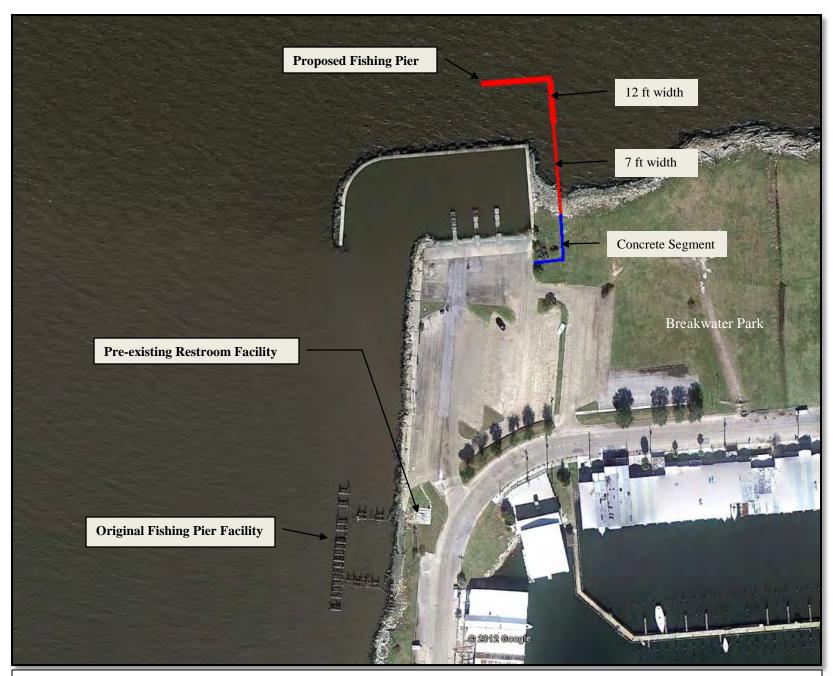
Proposed Project Structural Action Areas (FEMA 1603 DR LA – PW 11698 / AIDB 1776)
